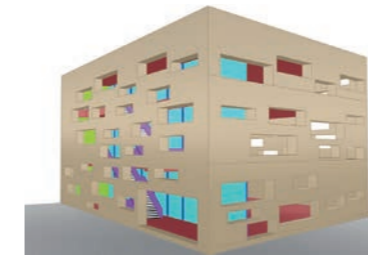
Perspective view of concrete walls with rectangular punched openings. (modelled by Spencer Culhane)
